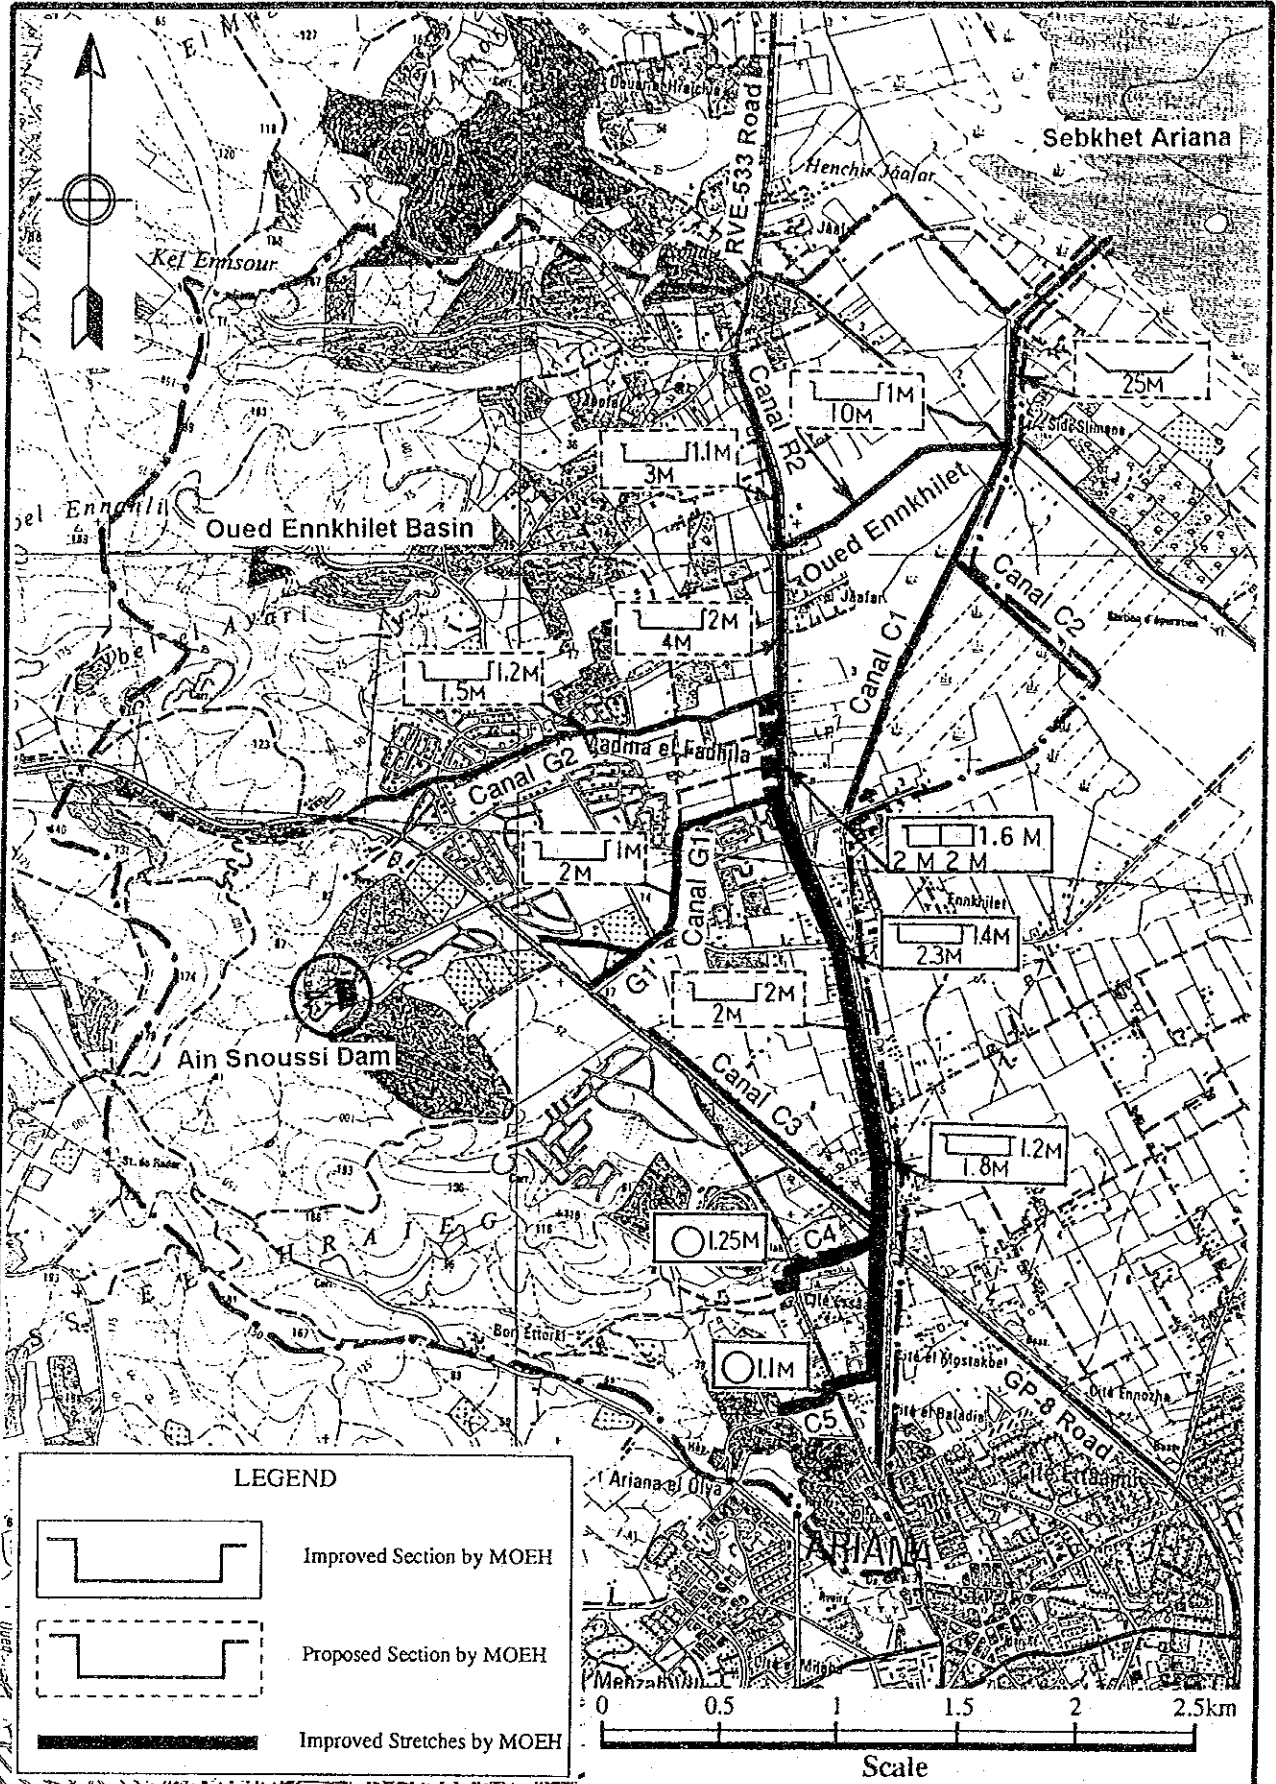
Existing and Proposed River Facilities in Oued Ennkhilet
